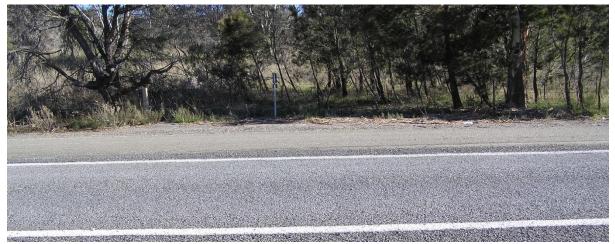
Brayton Road rehabilitation works_as at 21April2021
